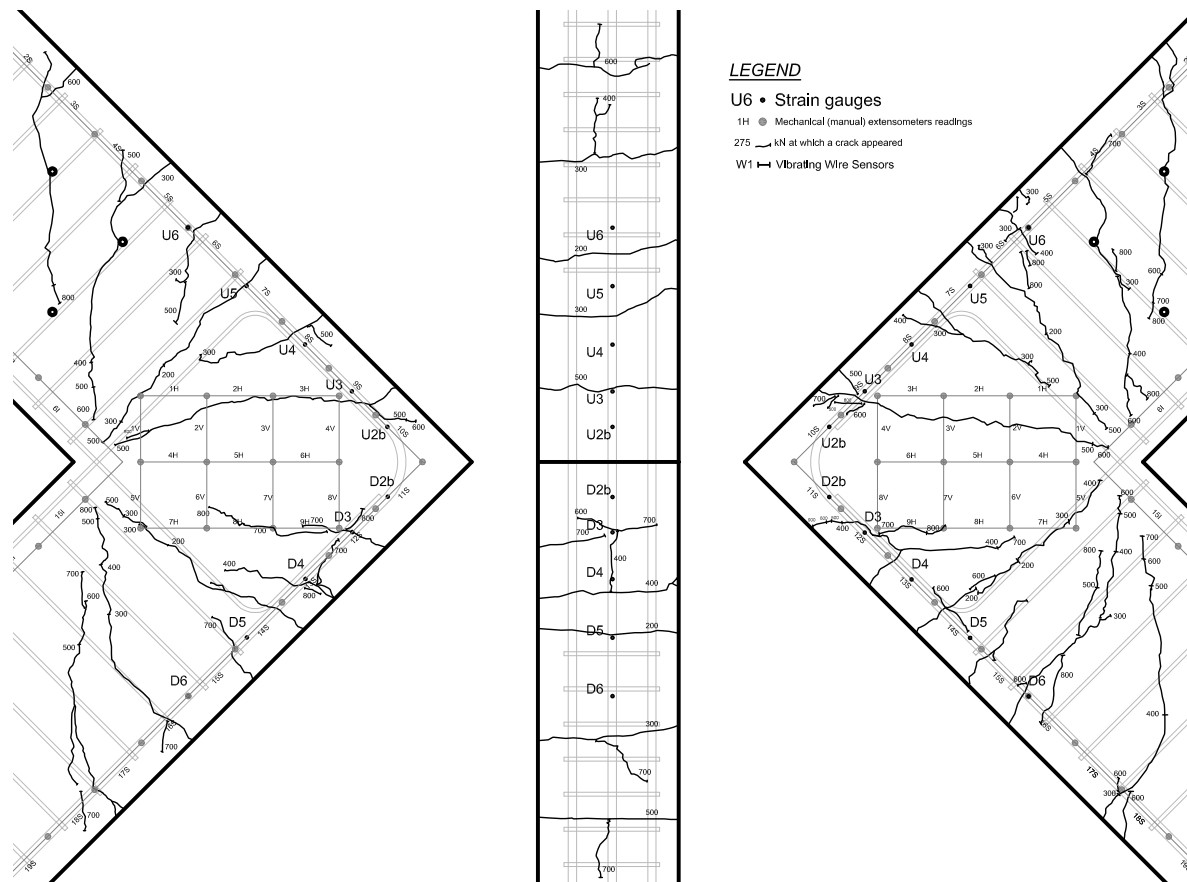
25-CV-25. Crack pattern at a load of 600 kN. From left to right: front view (A), side view, front view (B)
